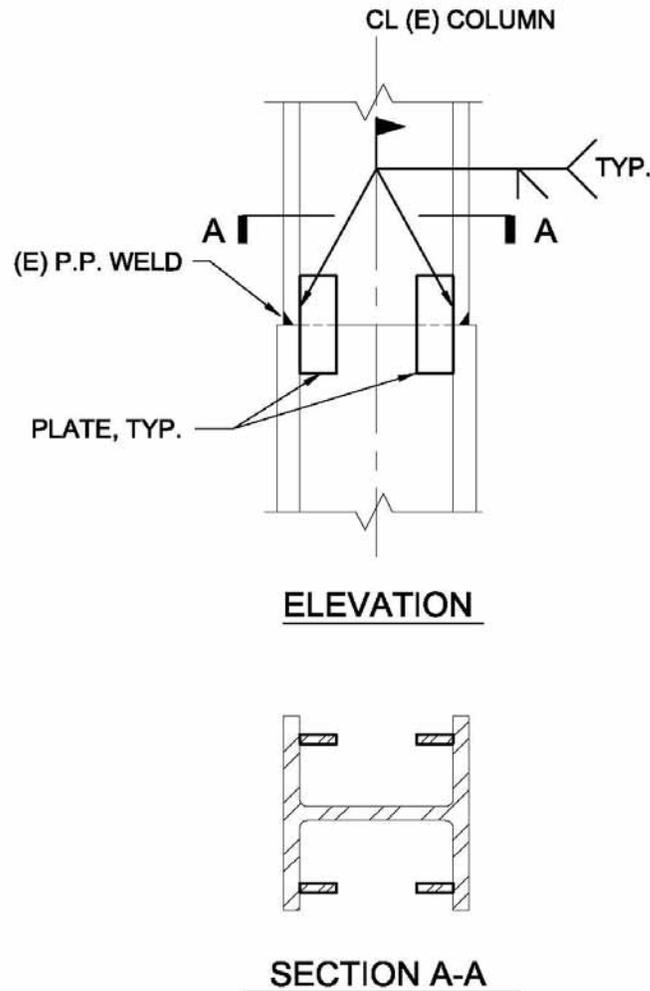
Welded Splice Upgrade at Existing Column
